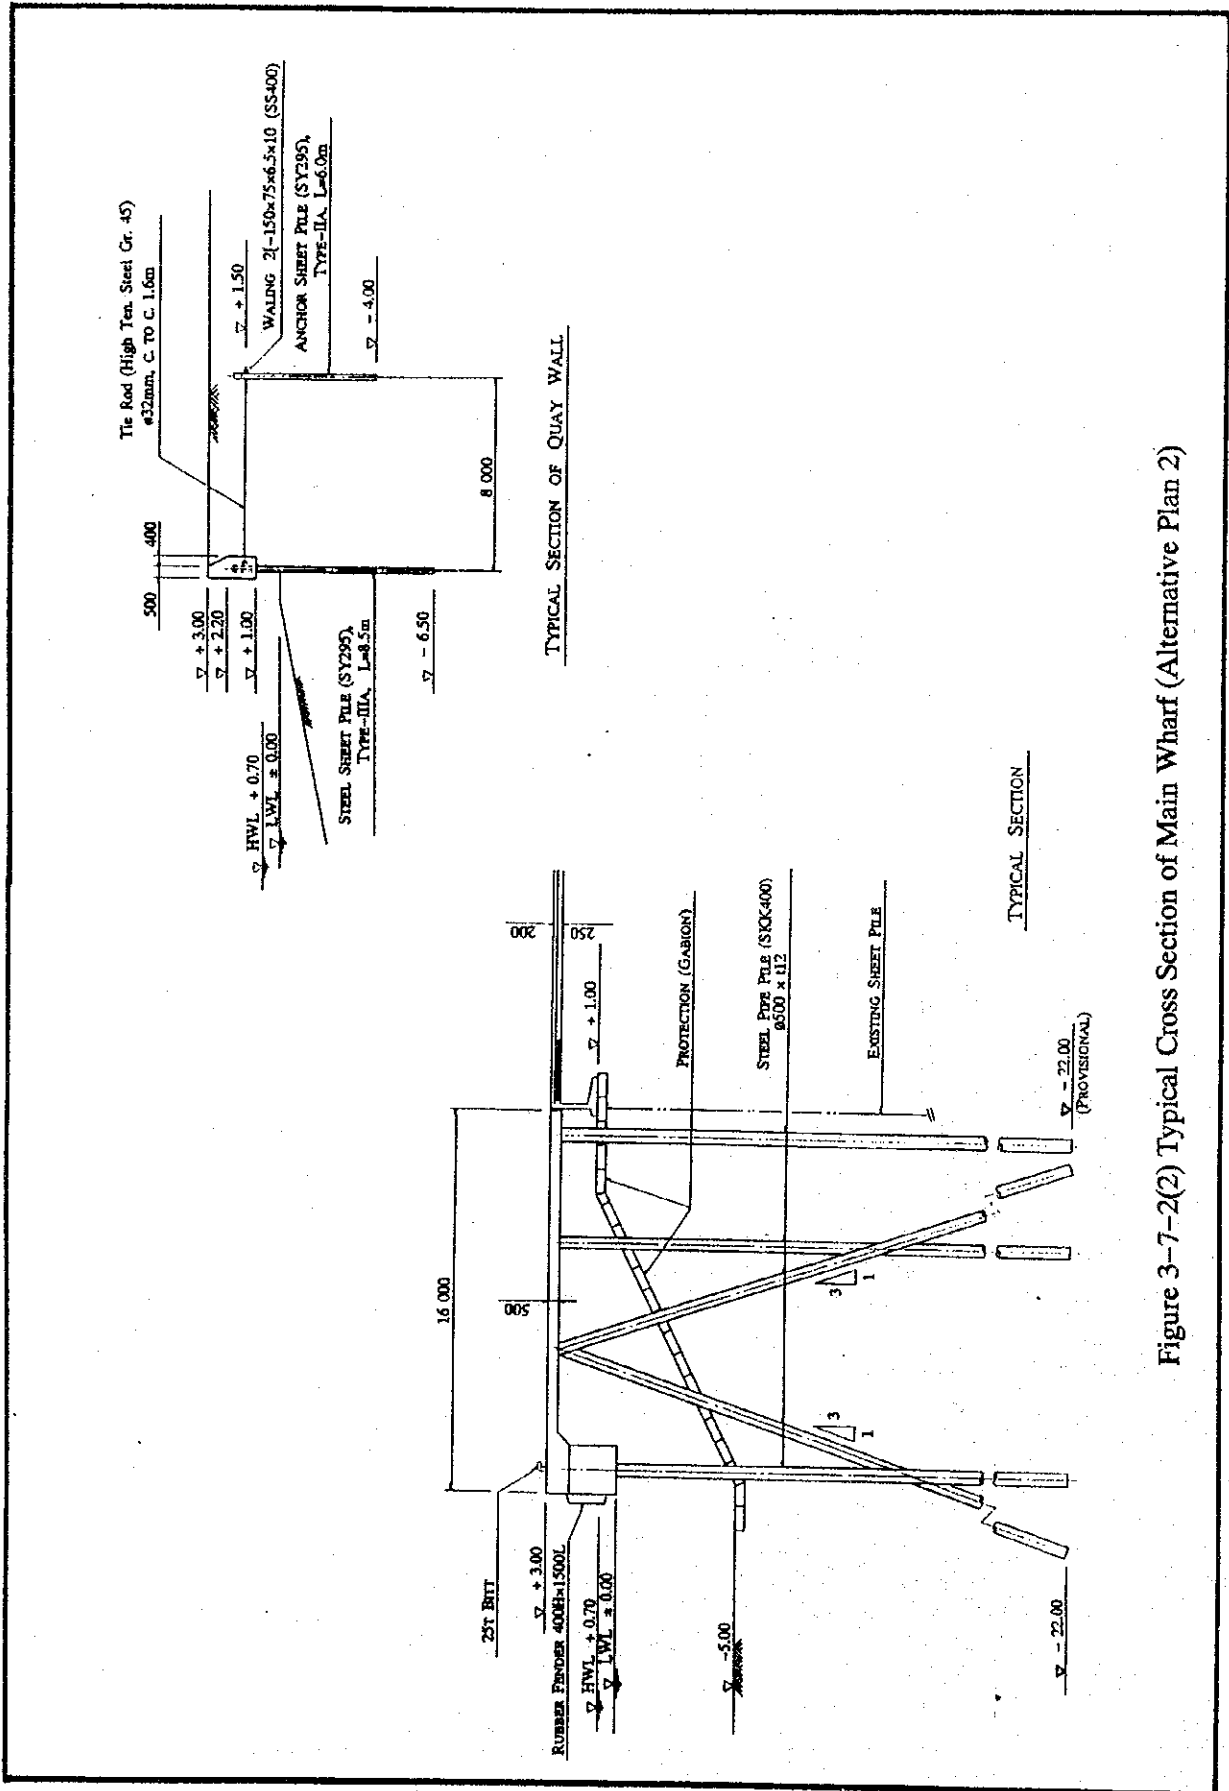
(2) Typical Cross Section of Main Wharf (Alternative Plan 2)
